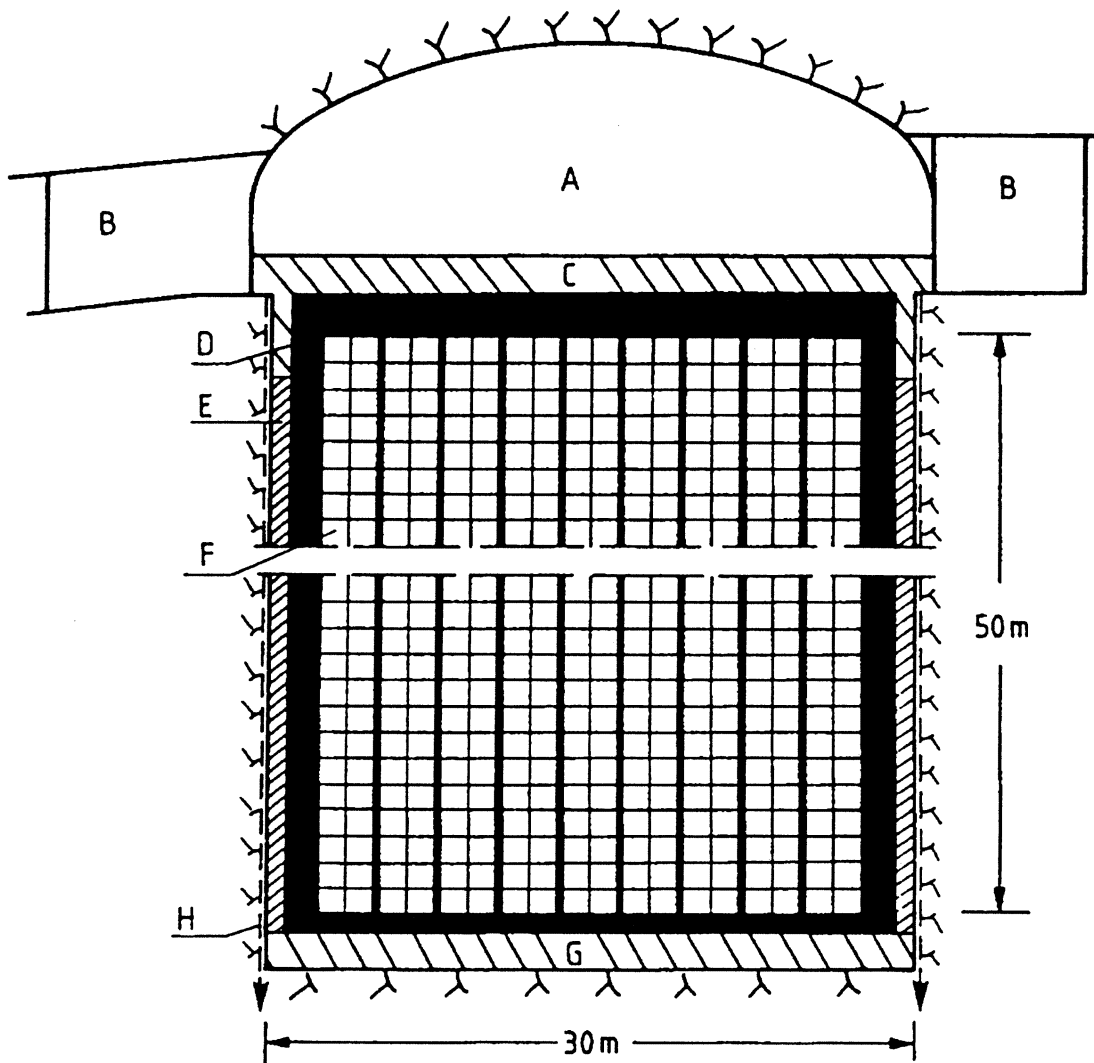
Schematic section of the SFR silo. (A) Compacted, cement-stabilized sand backfill. (B) Concrete plugs. (C) Bentonite/sand top bed. (D) Concrete silo. (E) Bentonite wall filling. (F) Waste. (G) Bentonite/sand bottom bed. (H) Drains connected to tunnel system.
